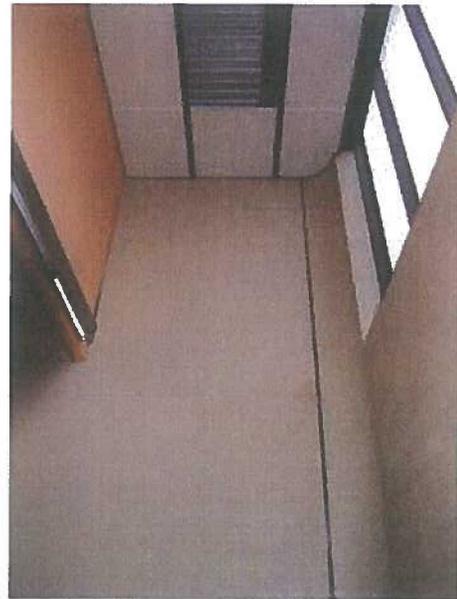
The photo above shows another of the many cracks in the first floor concrete slab on-grade in a stairwell.
